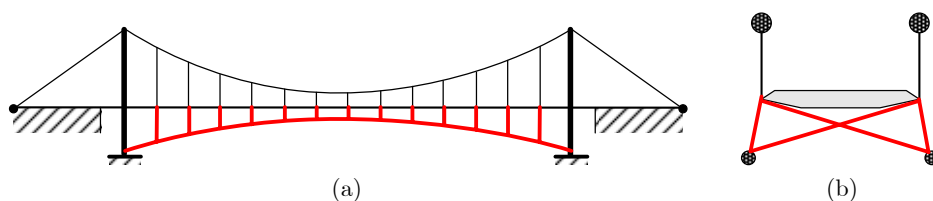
Suspension scheme with secondary cables and crossed hangers below the deck (a); cross-section (b)
